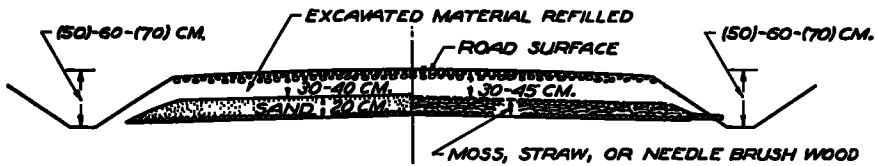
Insulation against Frost Damage. Figure shows excavation filled with original frost-heaving soil above the insulation layer. This is cheap construction and satisfactory for gravel roads of minor importance. On more important highways where a bituminous surface is used, a more satisfactory soil or a stone foundation is used above the insulation layer.
